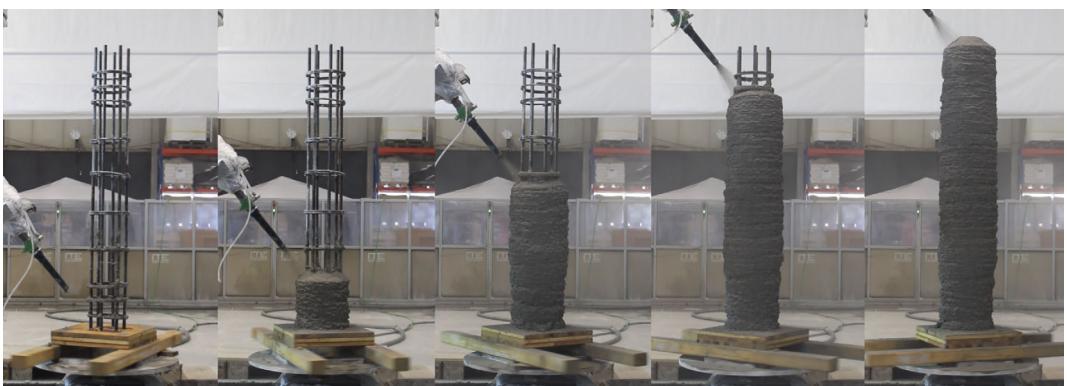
Reinforced column produced with SC3DP method on a rotating table. Source: Institute of Building Materials, Concrete Construction and Fire Safety, Division of Concrete Construction
